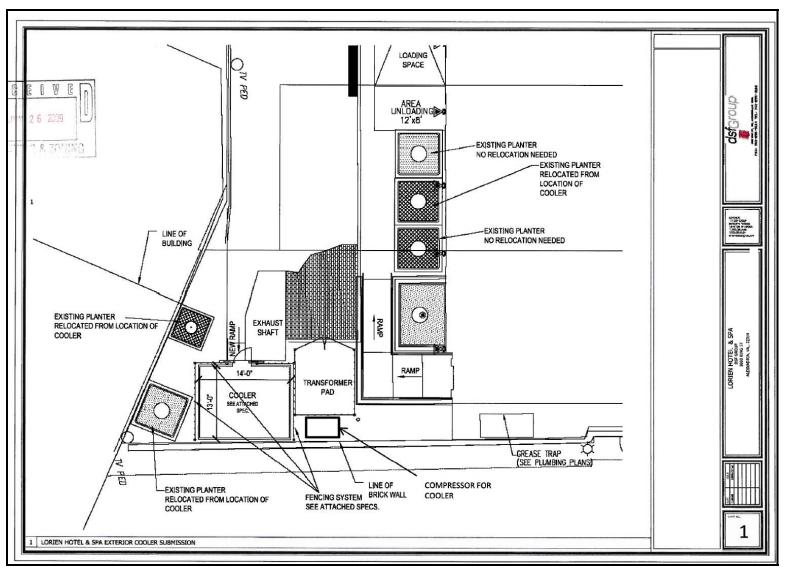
Site Plan showing proposed location of new walk-in-cooler.
